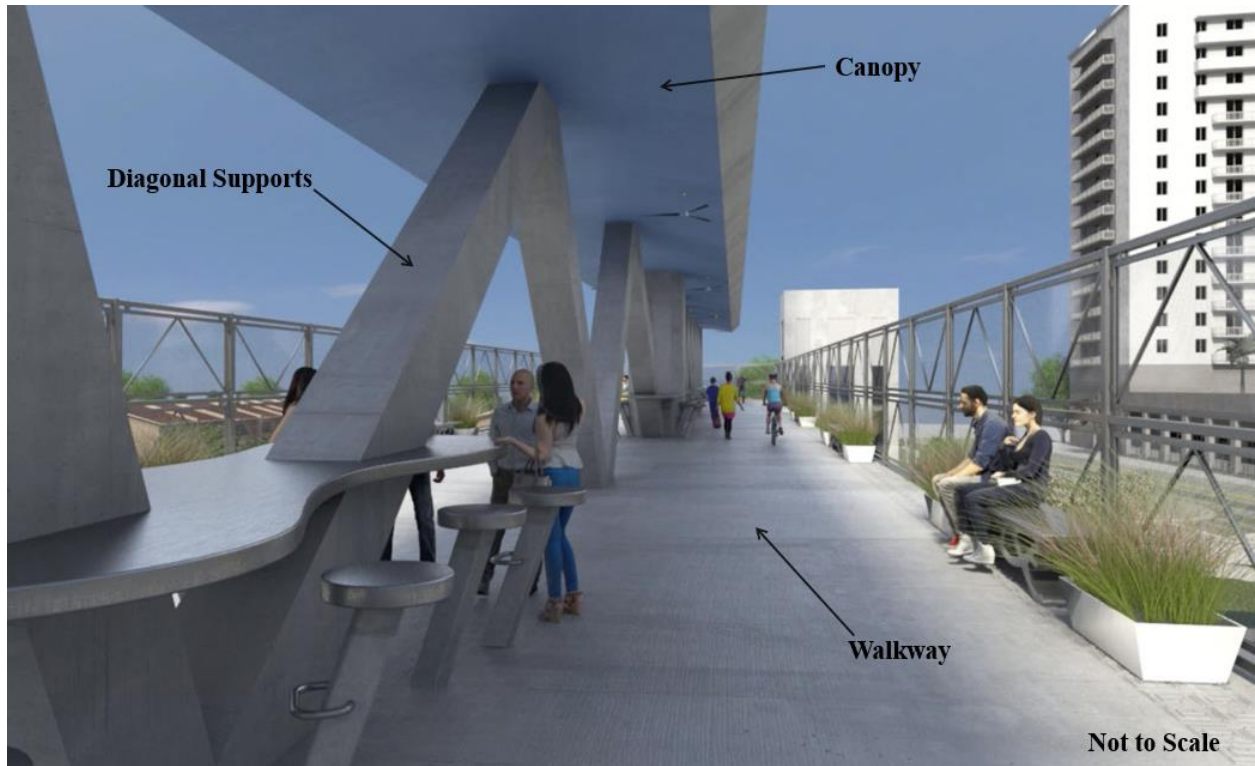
Rendering of what the pedestrian bridge walkway would look like when completed looking to the north (Source: FIU modified)
